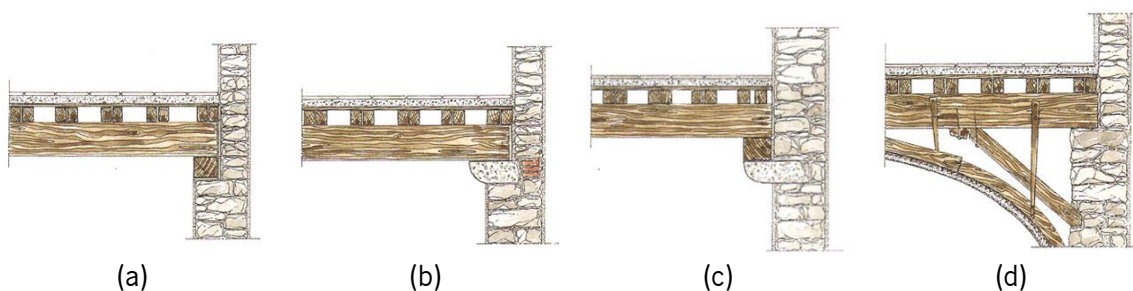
Examples of typical floor-to-wall connections (Maresta 2018).
